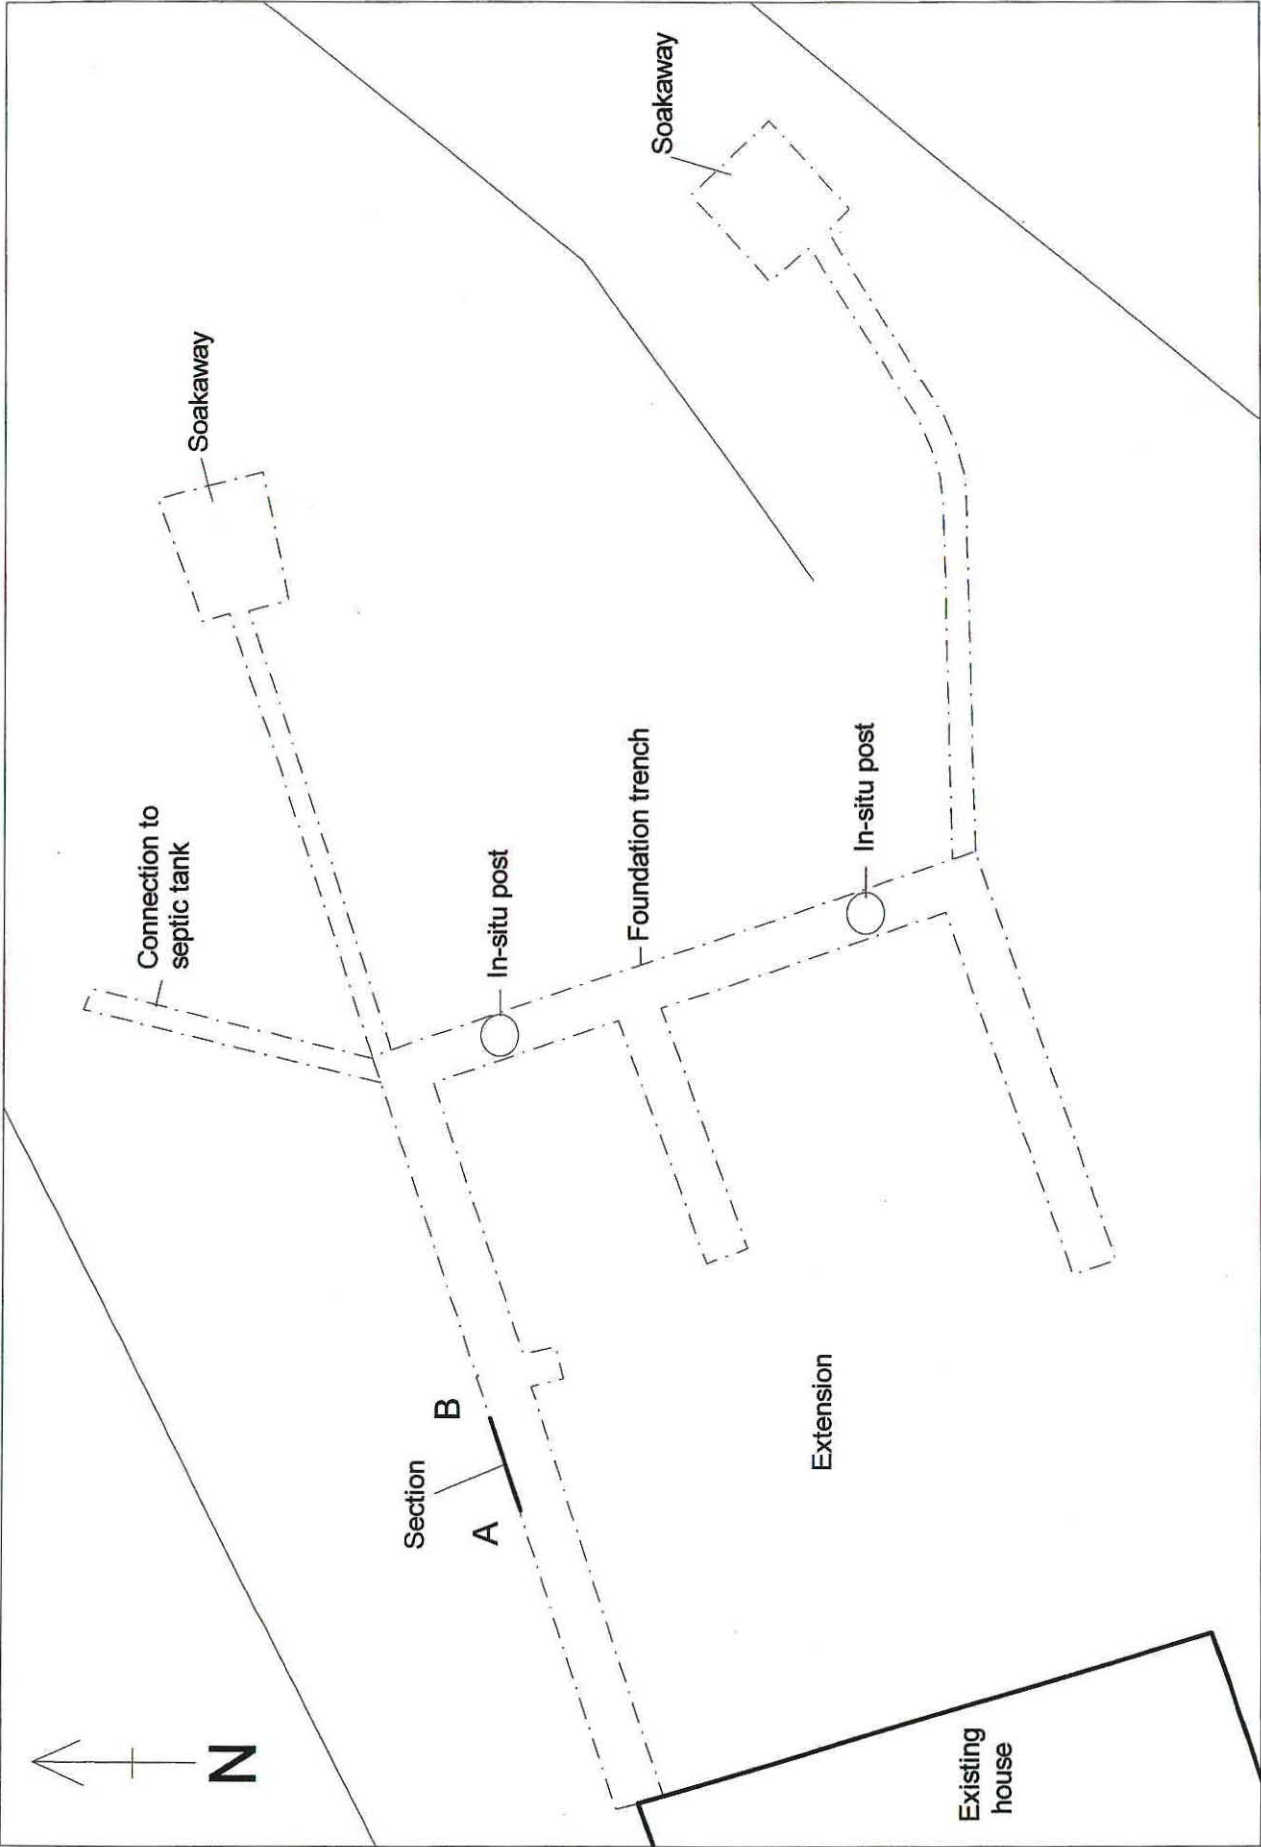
Excavations carried out during watching brief (Scale 1:100)
